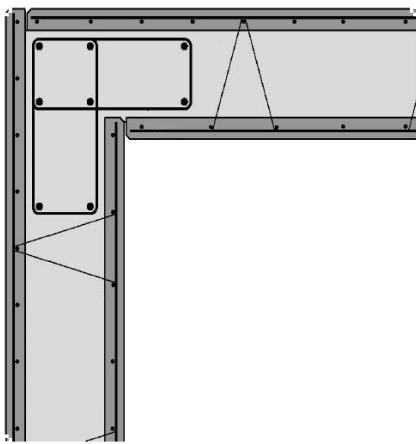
Corner joint example with prefabricated rebar cage connecting panels.
